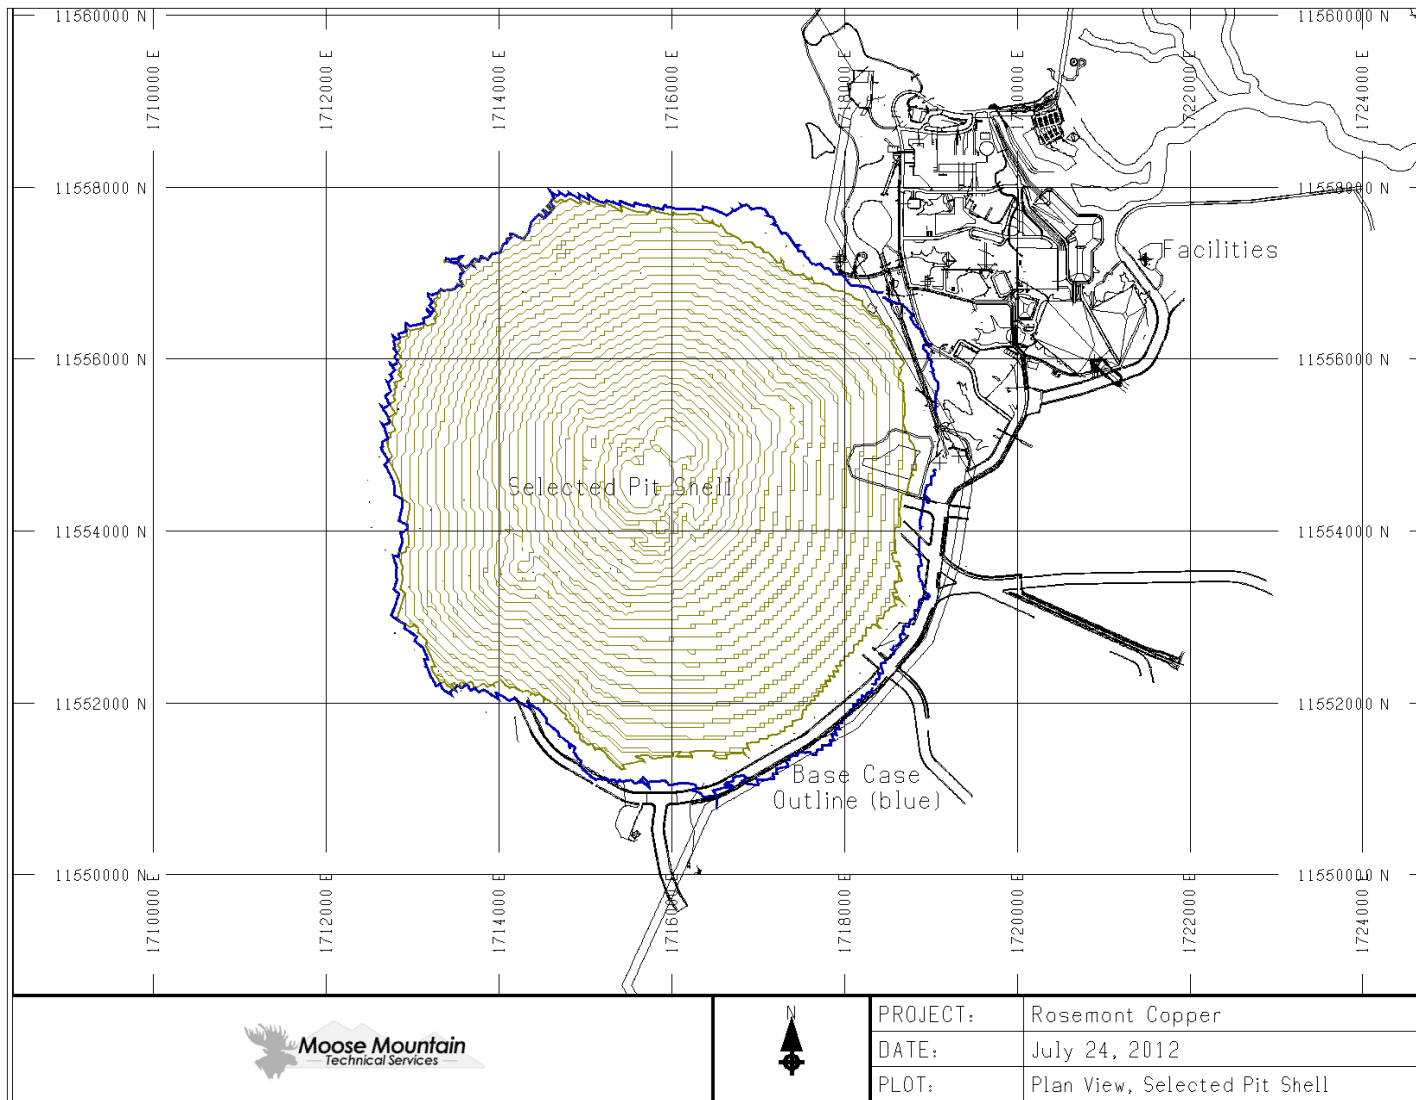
Plan View Contours of Selected Lerchs-Grossman Pit Shell
